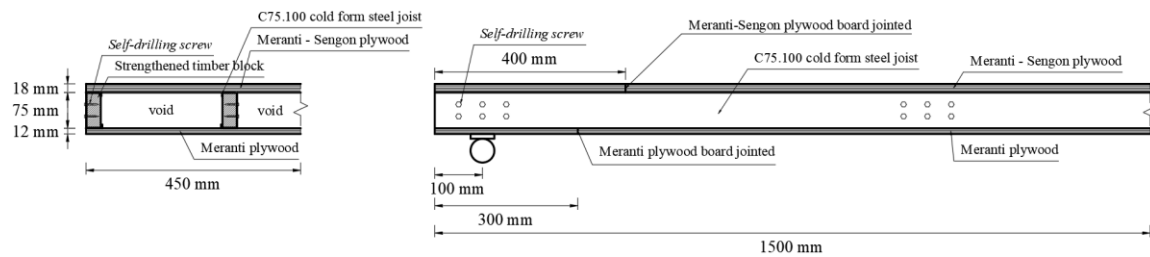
Cross-section of C75.100 cold-formed steel joist
